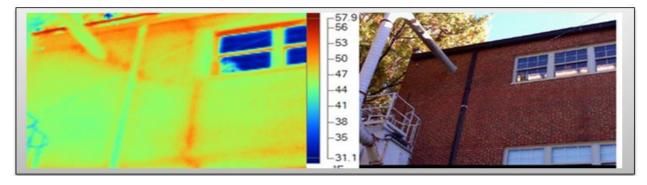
A thermal and visible light image showing heat loss as a result of cracks in the wall on building 1.
